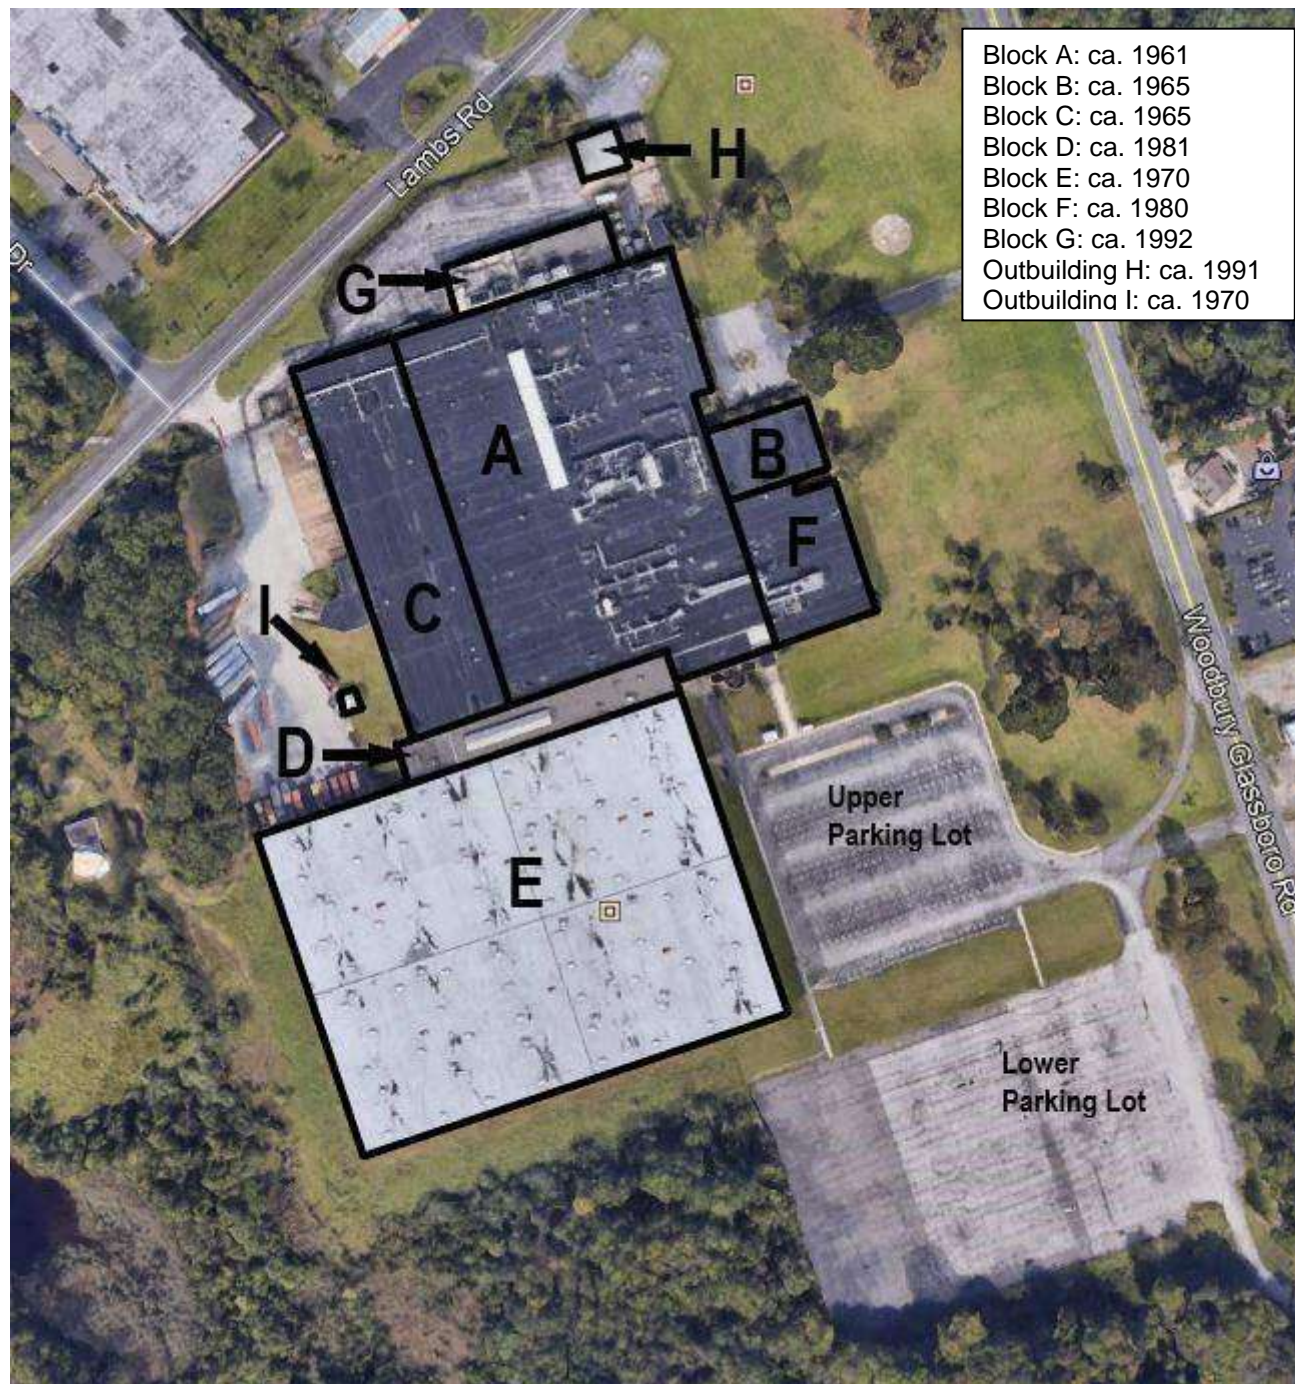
Labeled aerial view of Sony Plant outlining the additions to the plant from the various periods of construction.
